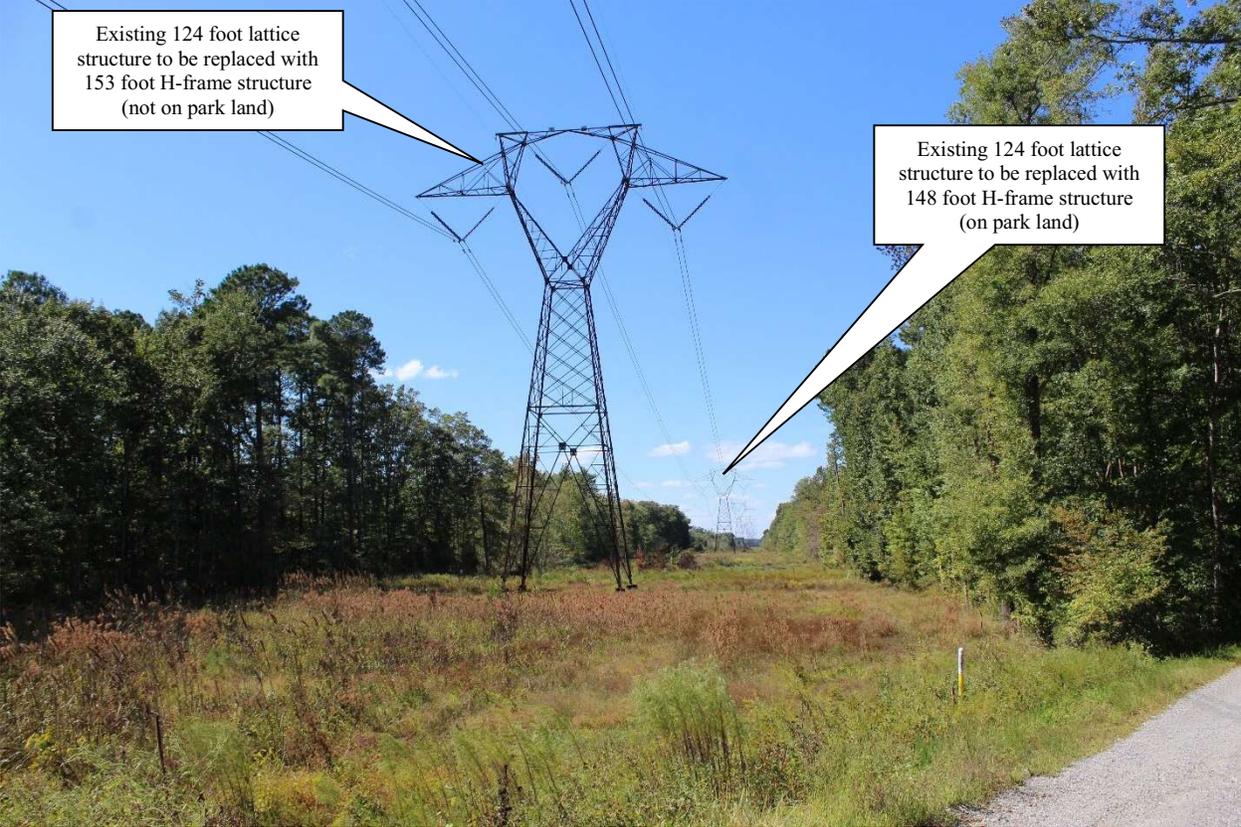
Photo location 3- View from Cold Harbor Road at ROW crossing, facing west.
